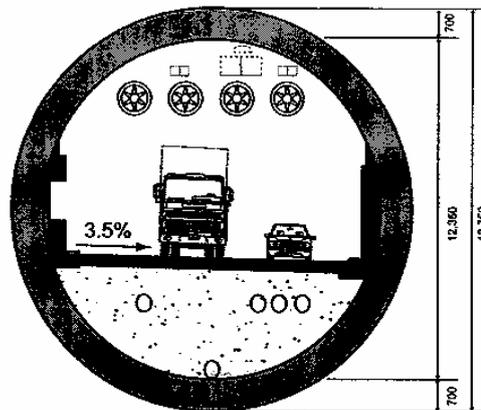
Standard Cross-section of No.4 Elbe Tunnel^[62, Bundesrepublik Deutschland]
